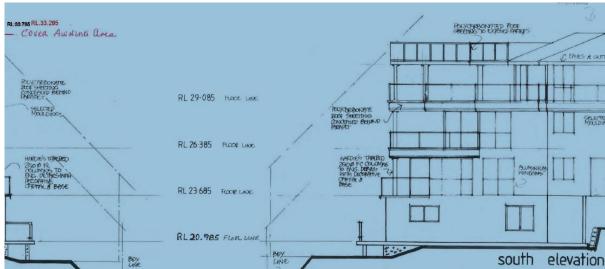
/b - heights of existing building obtained from previously approved plans (DA/49938/2016/A)
